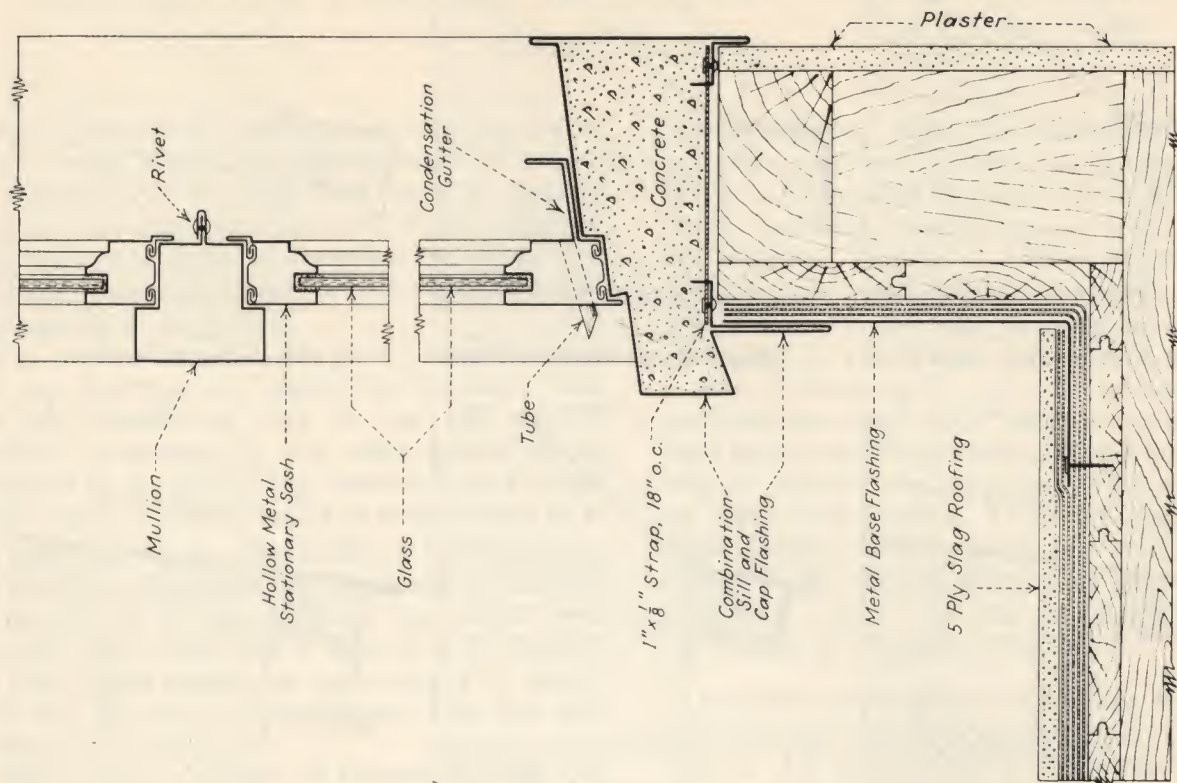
METAL SILL OF SAWTOOTH SKYLIGHT AND COMPOSITION ROOFING
